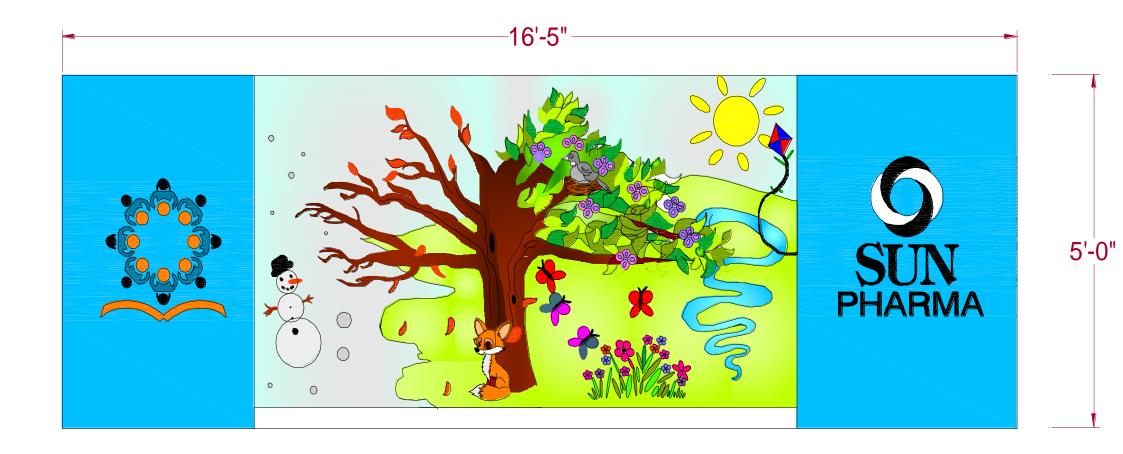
PROPOSED WALL DESIGN BEHIND MID-DAY MEAL AREA OPTION-III
